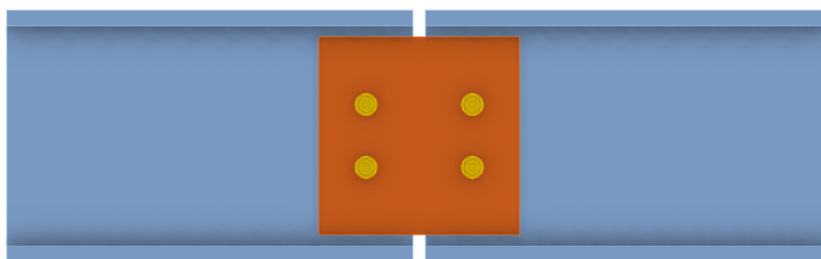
Connection between the beams. 4 Bolts of type M20.
